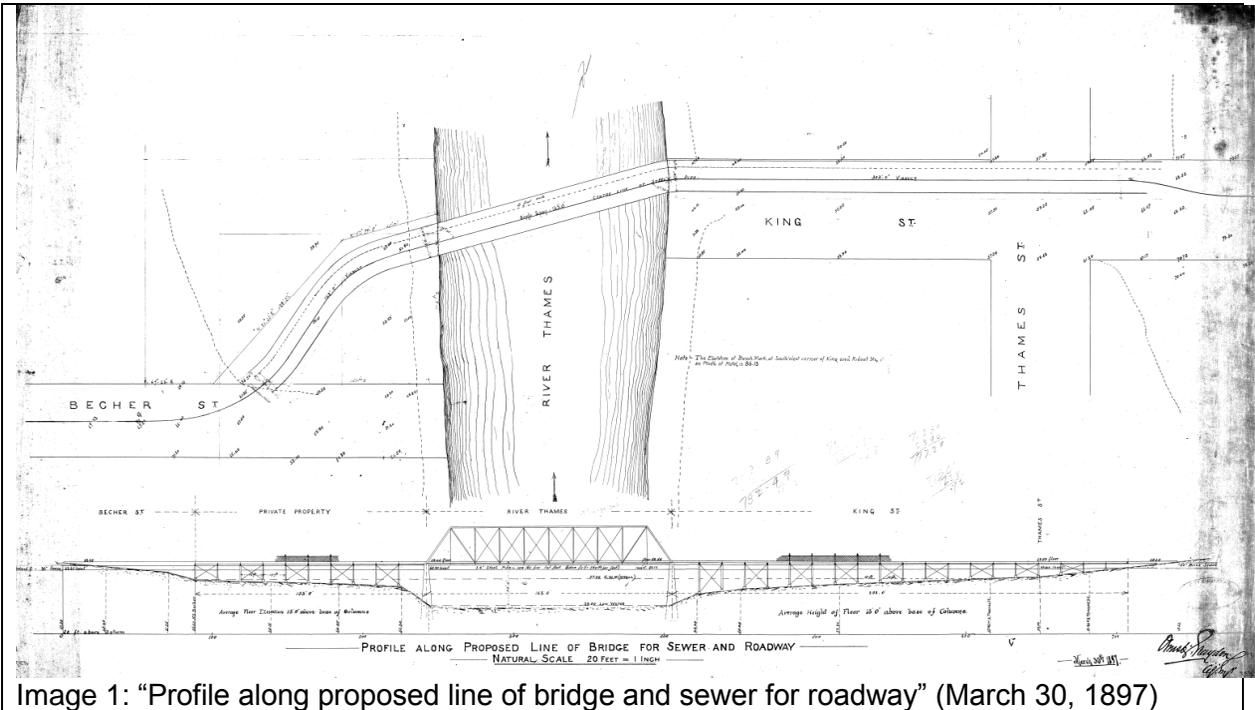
"Profile along proposed line of bridge and sewer for roadway" (March 30, 1897)
